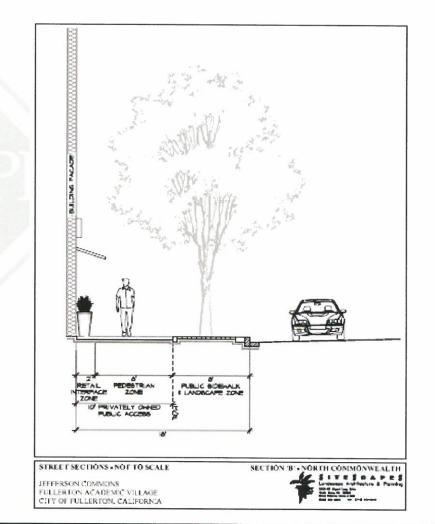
Conceptual Landscape Cross-Section: Commonwealth Avenue
